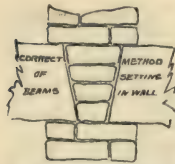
PROPER METHOD OF RESTING BEAMS ON WALLS.
